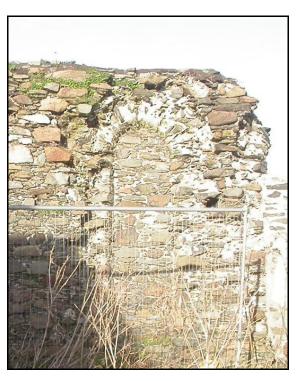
(Above) North face of Malachy's Wall (taken from north- east facing south-west).
